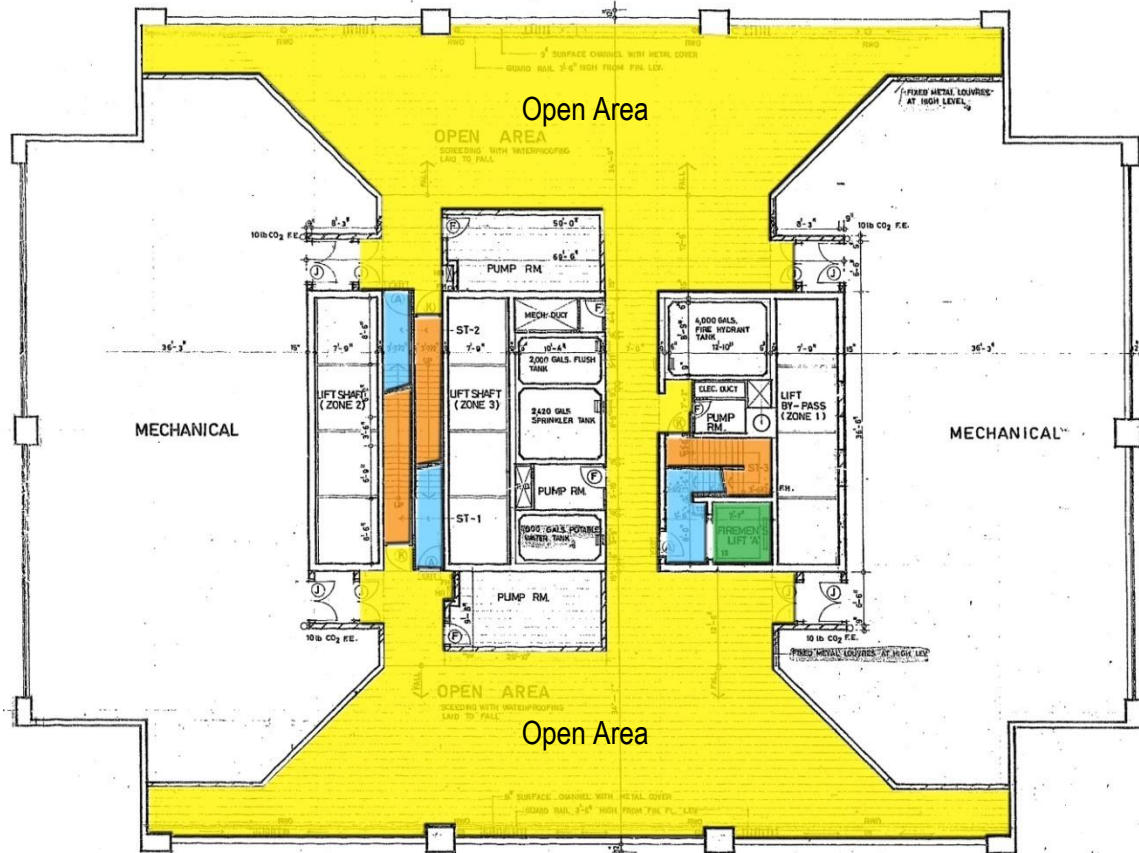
Level 14 relief floor (Palmer and Turner 1976)
